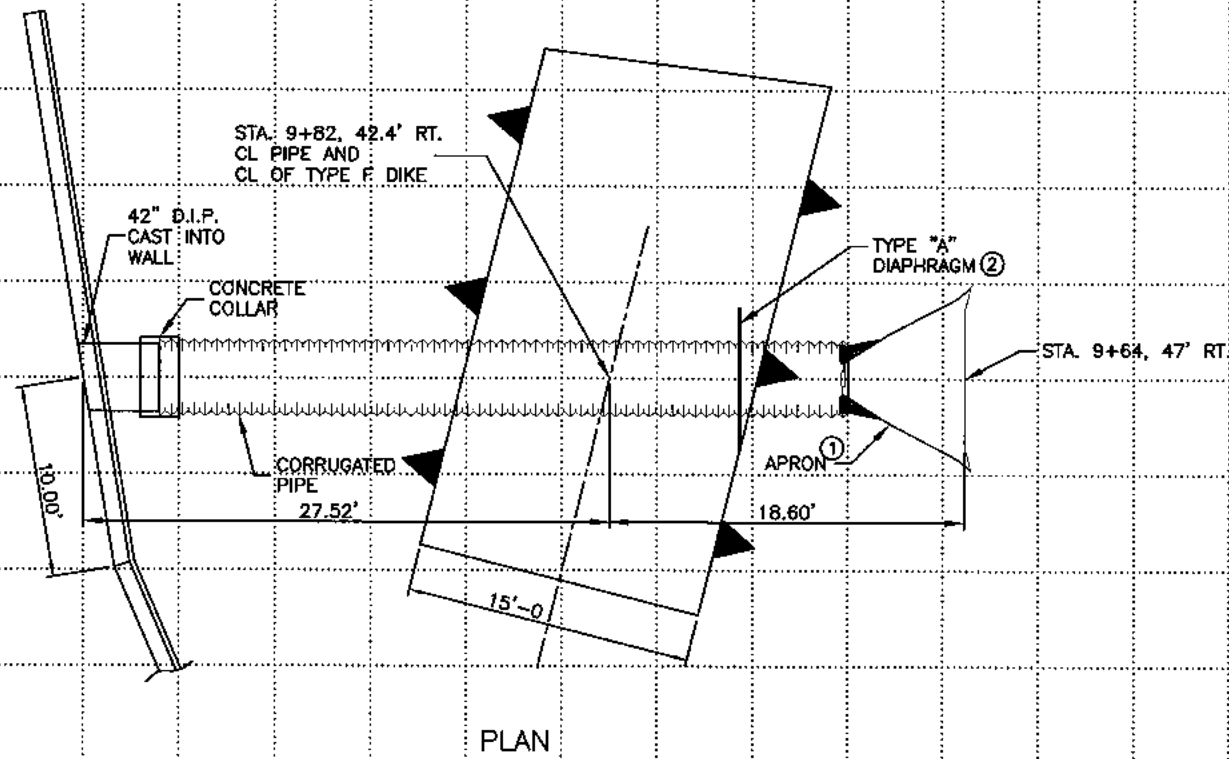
DETAIL OF SUPPLEMENTAL REINFORCING FOR INSTALLING CMP LETDOWN THROUGH CULVERT HEADWALL.
